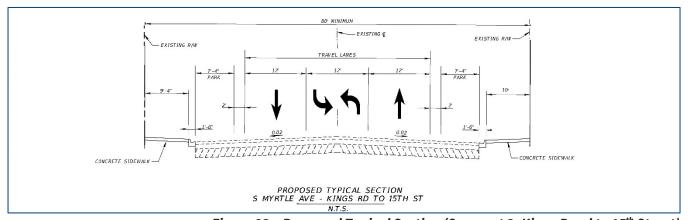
Proposed Typical Section (Segment 3, Kings Road to 15th Street)
